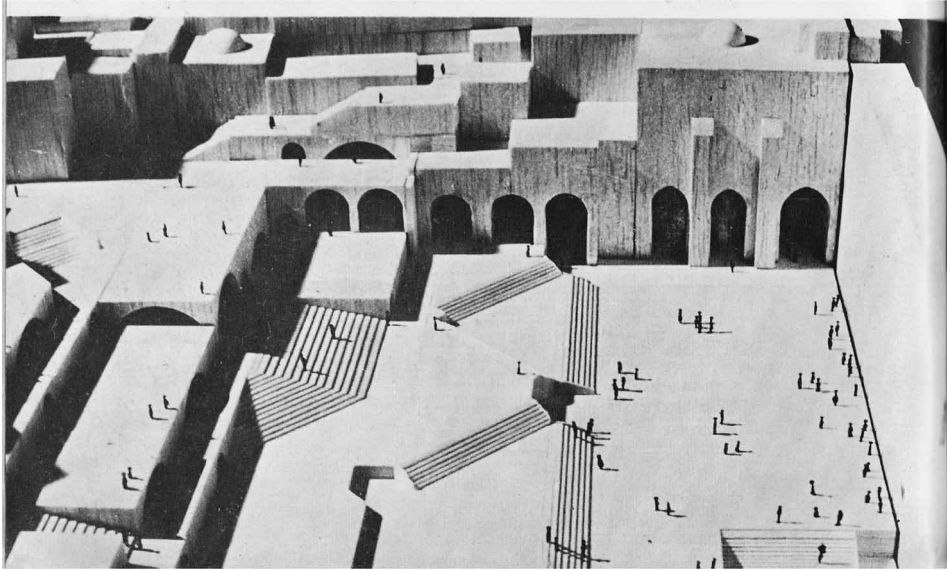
The Western Wall Plaza Safdie plan, 1973.
